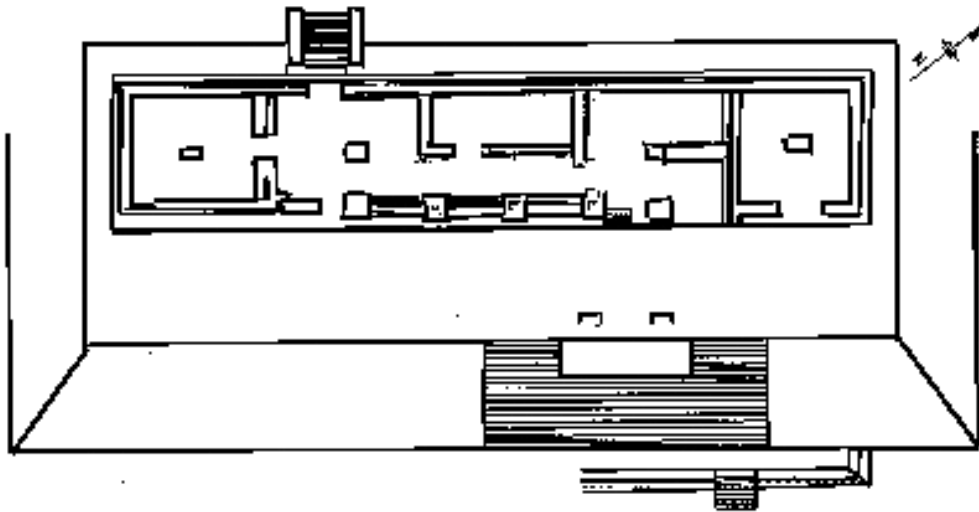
Plan of Building Y, El Tajin (After ReoCities, n.d.)
